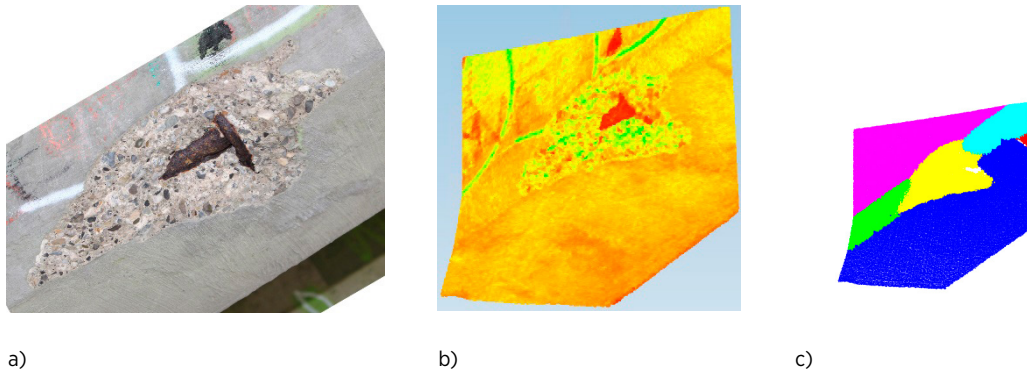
A hierarchical method for identify a point cloud of damaged surfaces; a) Photo of the girder's section containing spalling; b) Point cloud of the surface; c) Resulted damage detection (Truong-Hong and Laefer, 2019)
